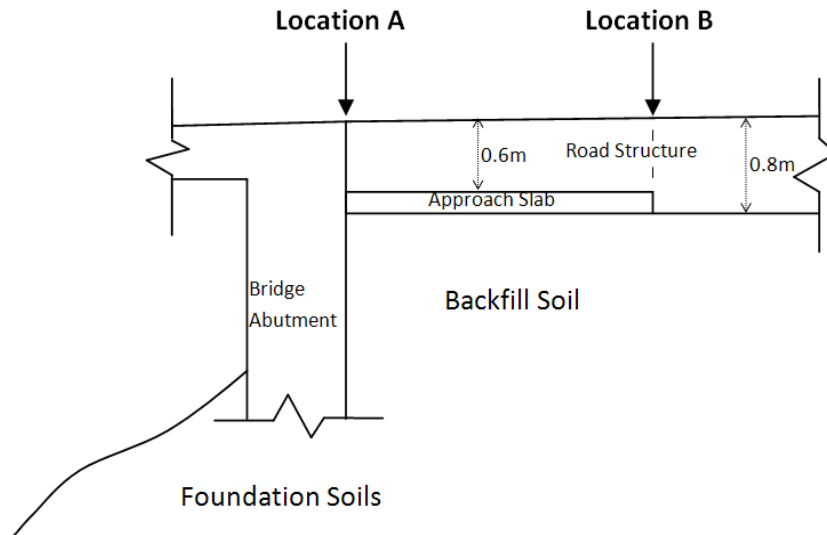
Illustration of approach slab road structure and integral bridge structure link
